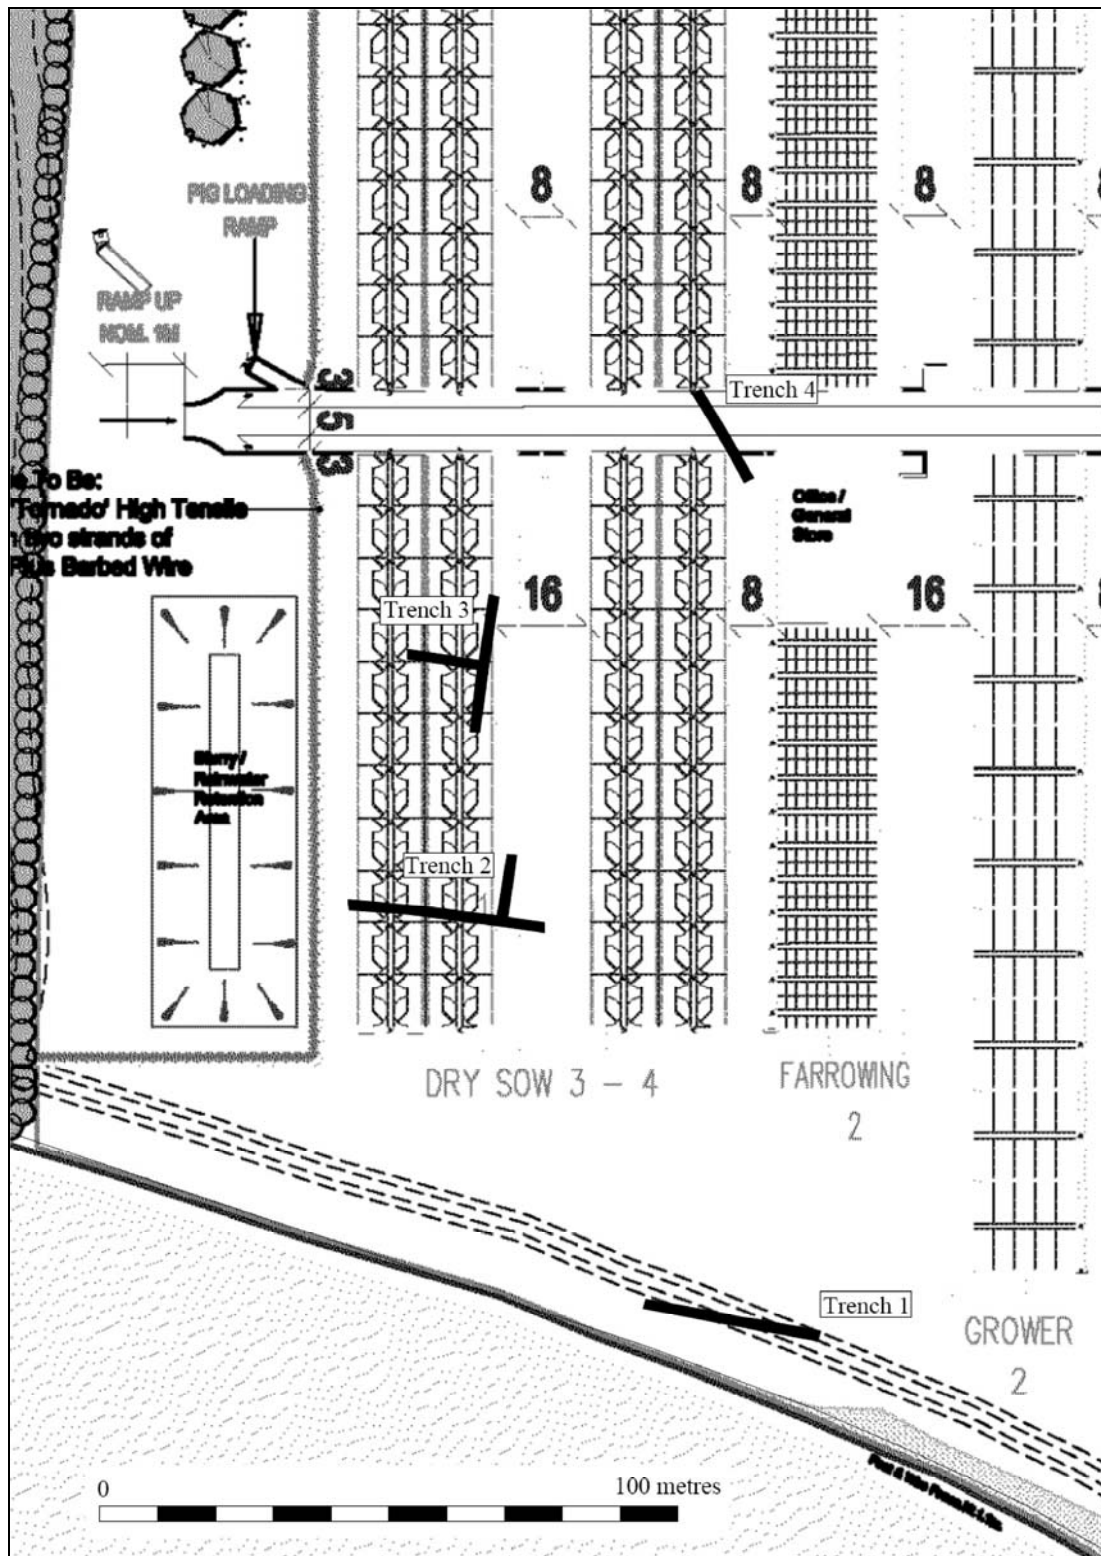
Trench location plan incorporating proposed development plan (provided by the client)
